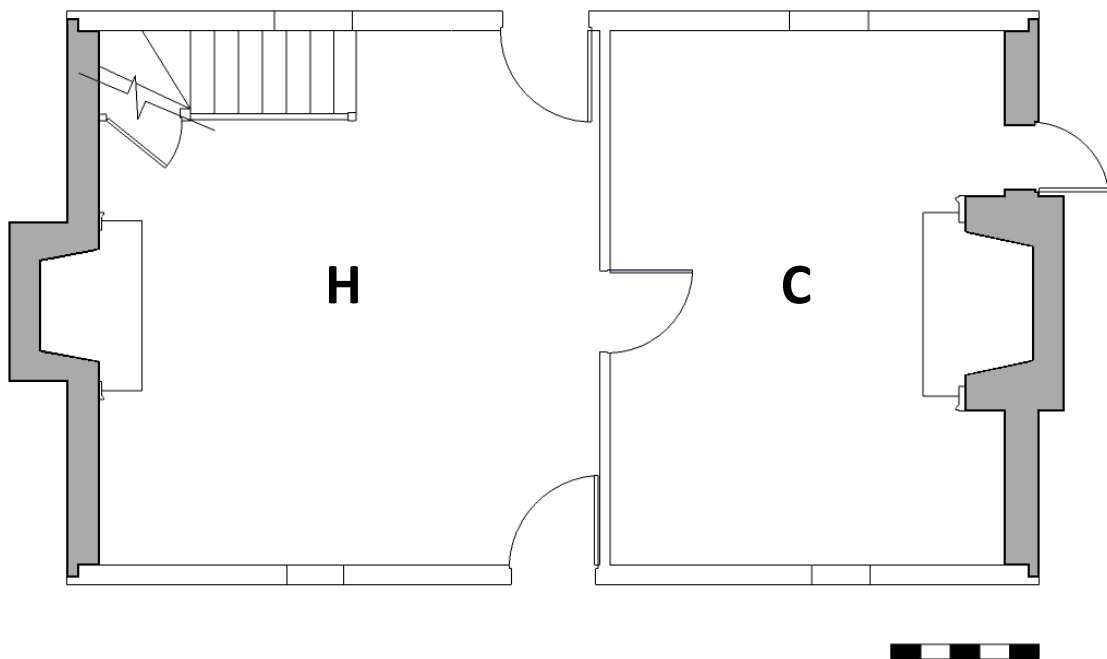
Ground-floor plan of Mister Place, Accomack County, built c. 1780. Mister Place is a typical hall-chamber house of eighteenth-century Accomack County, and is probably the most similar building to White Place that remains extant. Drawing by author.
